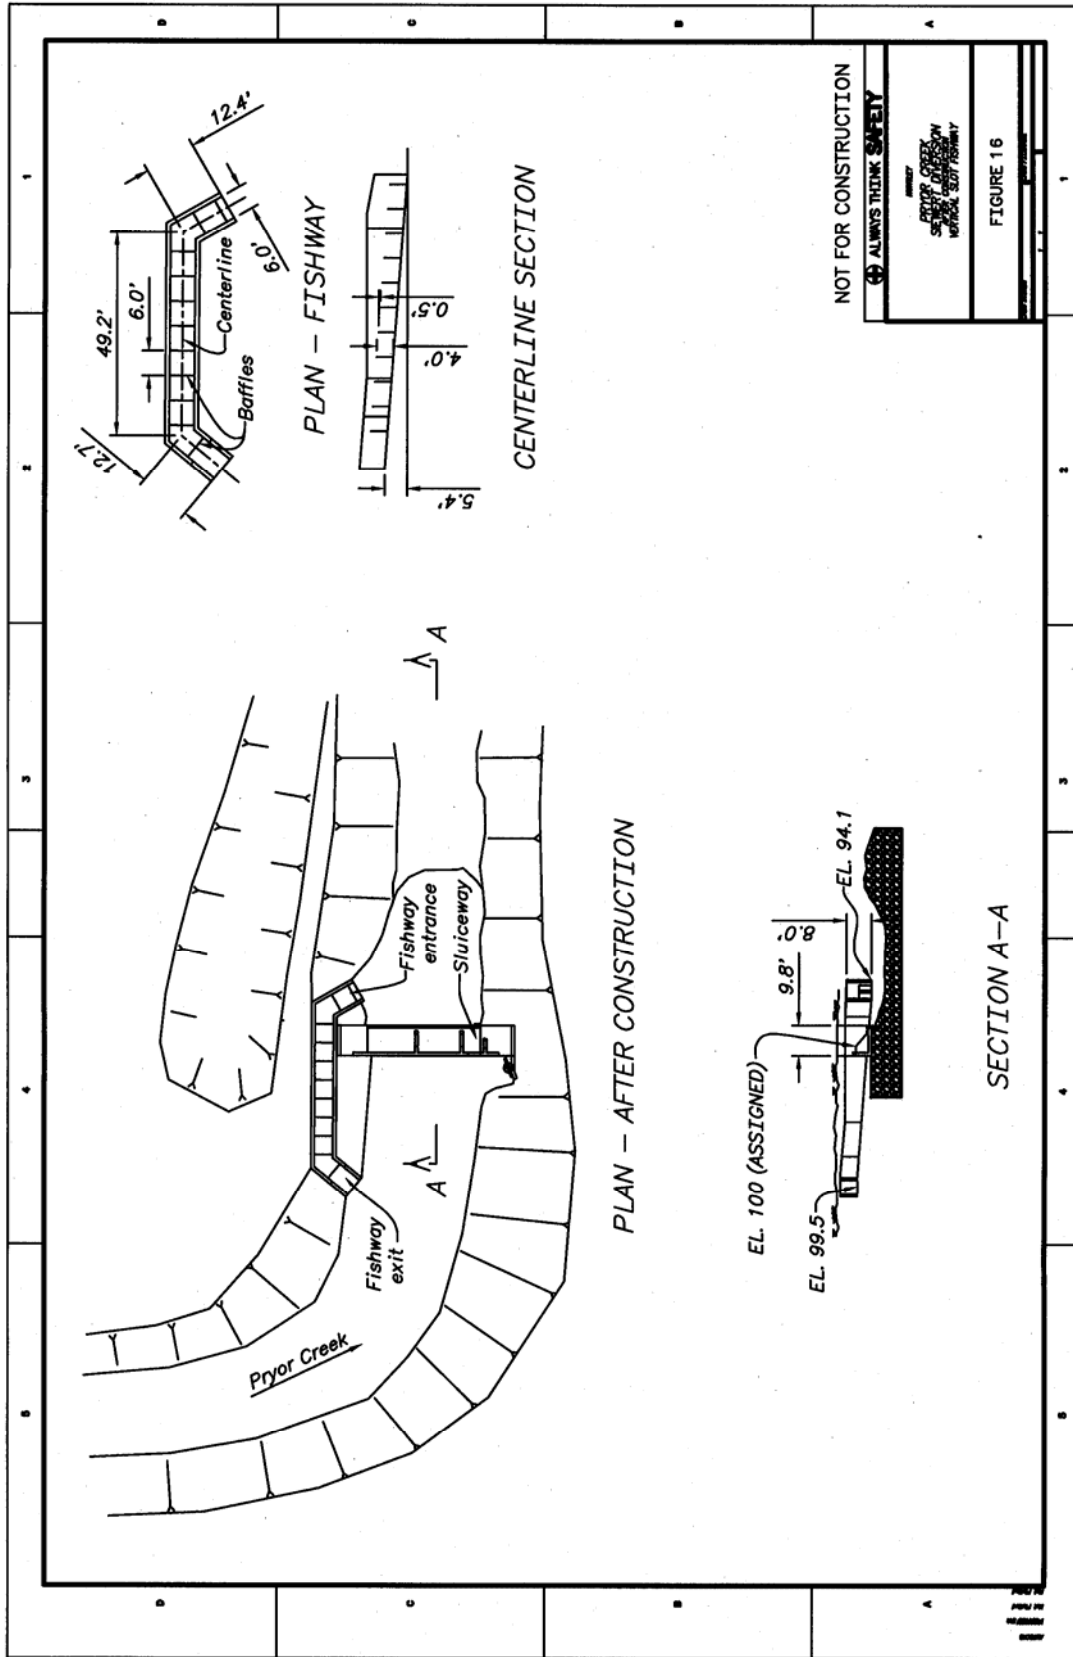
Plan and sections of a vertical slot fishway option, Siewert Diversion Dam on Pryor Creek
